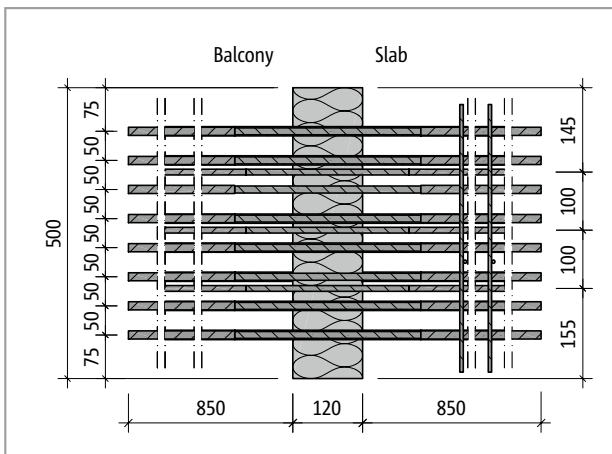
Schöck Isokorb® XT type K-M13: Product layout
